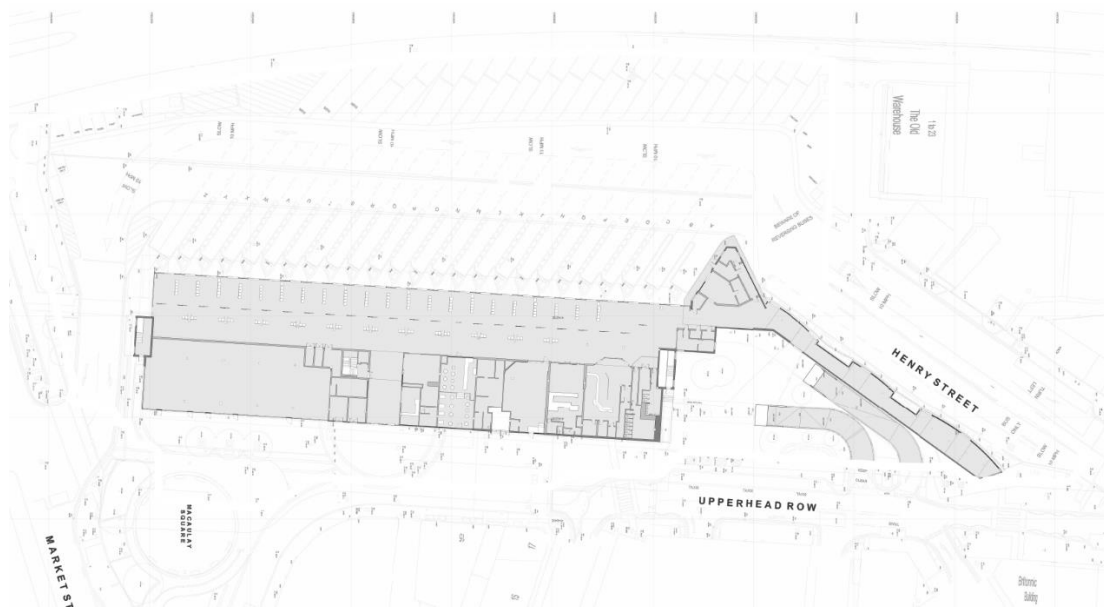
Existing Site Layout (source: *AHR Architects*)
